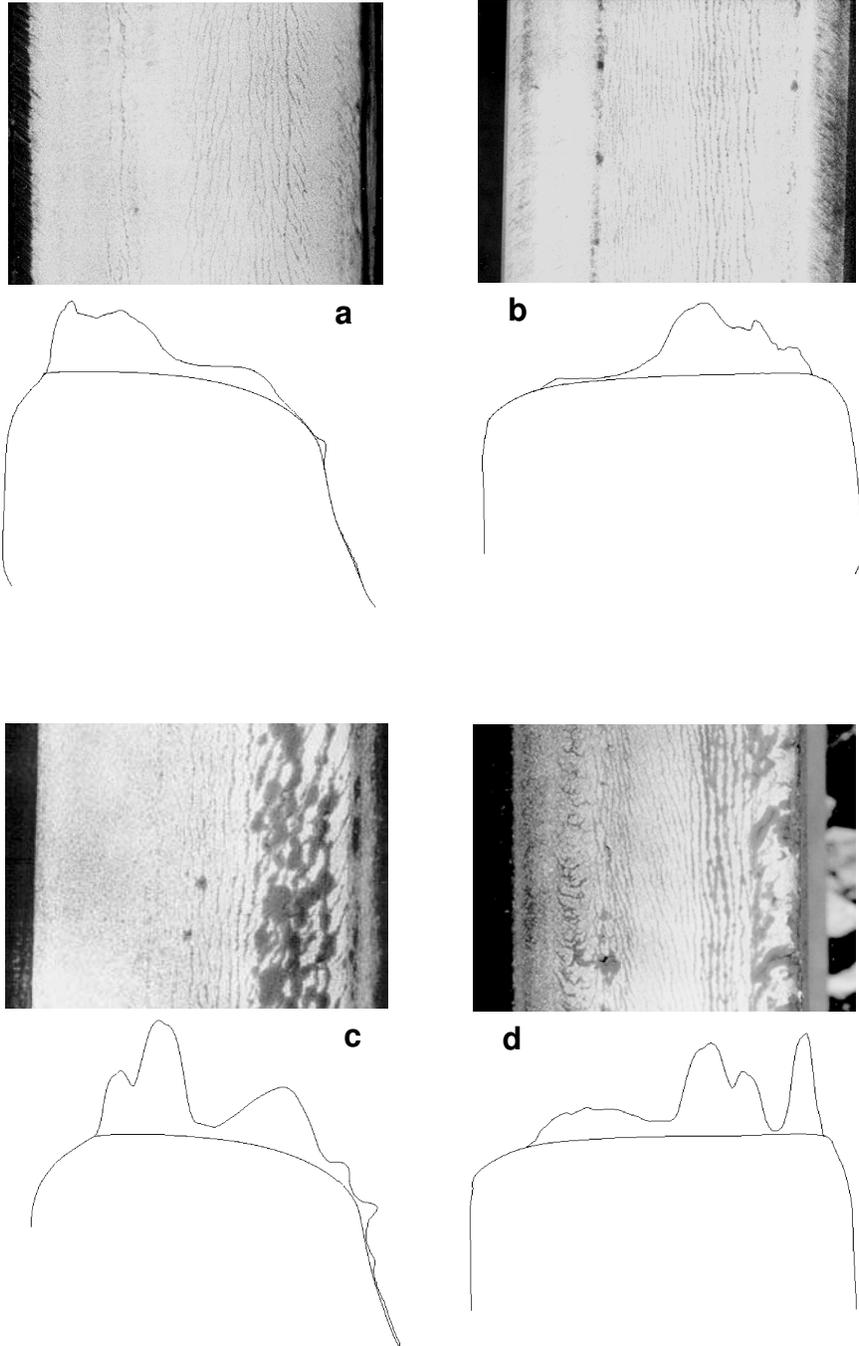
State of rail surface cracks and pummeling diagrams on preventive (a and b) and corrective (c and d) ground rail in the Lakeside test site.
